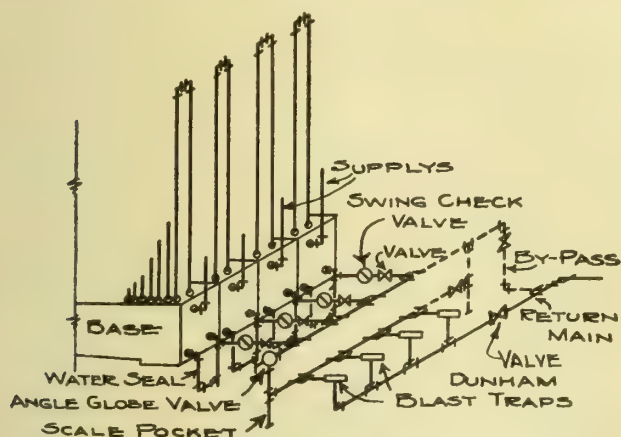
SHOWING METHOD OF DRAINING BOTTOM OF STEAM RISER IN AN OVERHEAD SYSTEM
